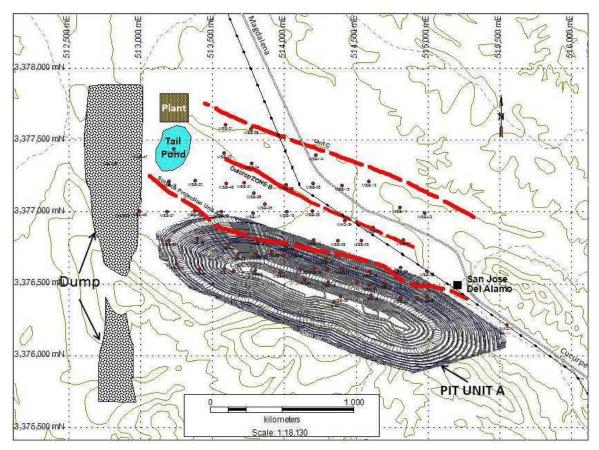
Plan of Proposed Mine Pit, Plant, Dumps and Tailings.
